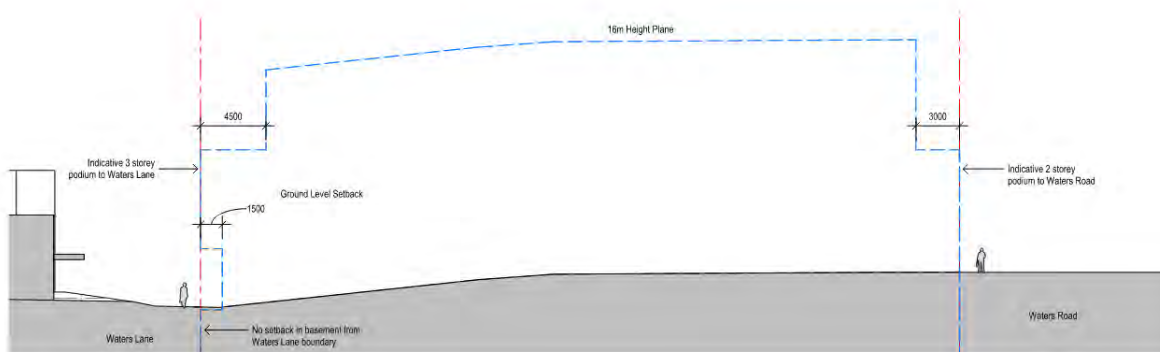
Permitted Building Envelope illustrated in section (source: SJB Architects)
